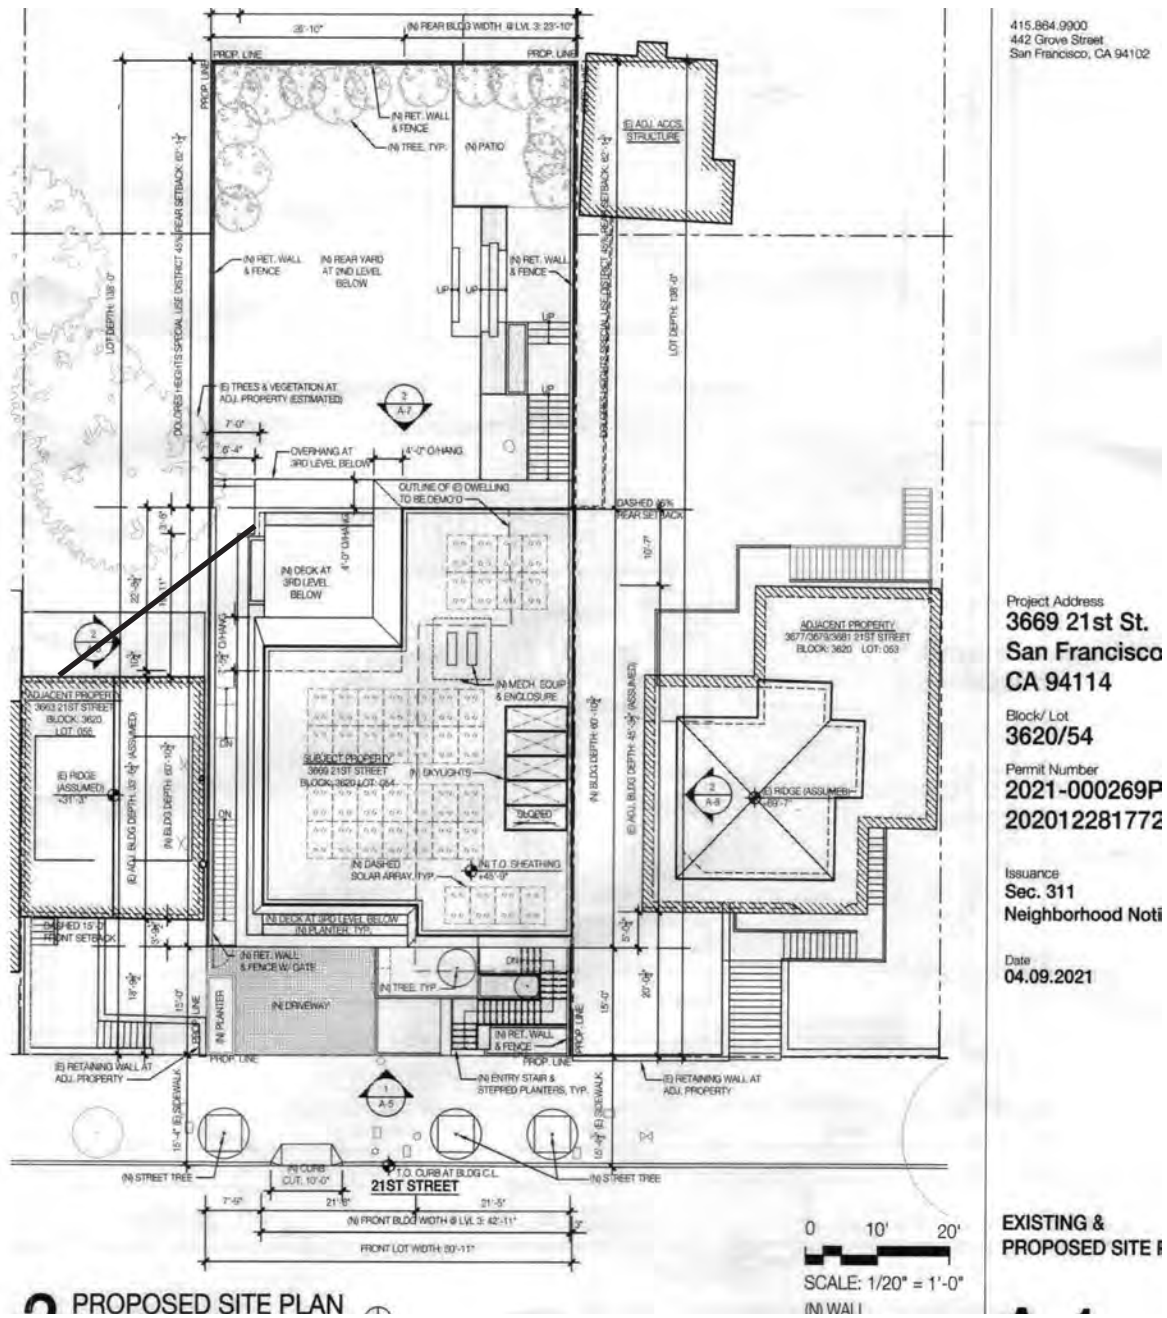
, detail of 3669 21st Street proposed site plan, sheet A-1, line superimposed showing view from rear deck to my property windows, at left
